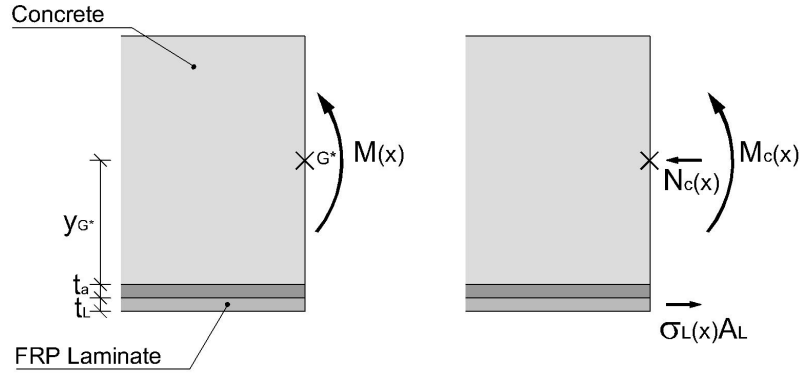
Forces acting in a section of an element between two existing cracks.
